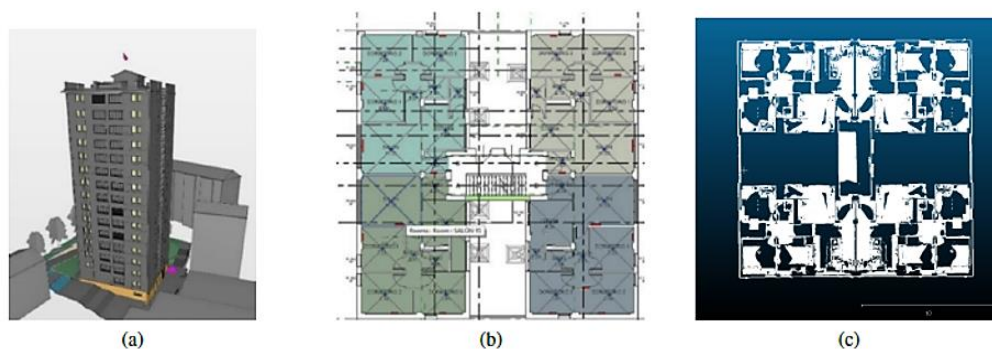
Bilbao Building dataset: (a) 3D model generated manually by the BIM modeler; (b) plan view of one floor; and (c) the point cloud of one apartment
